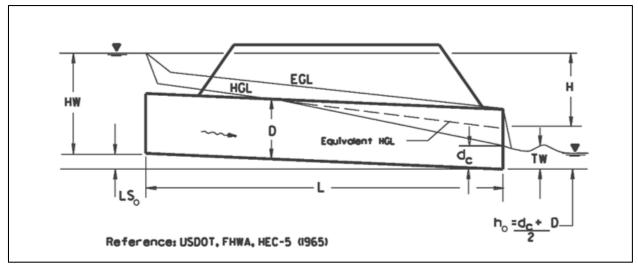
Tailwater for Unsubmerged Outlet Conditions
